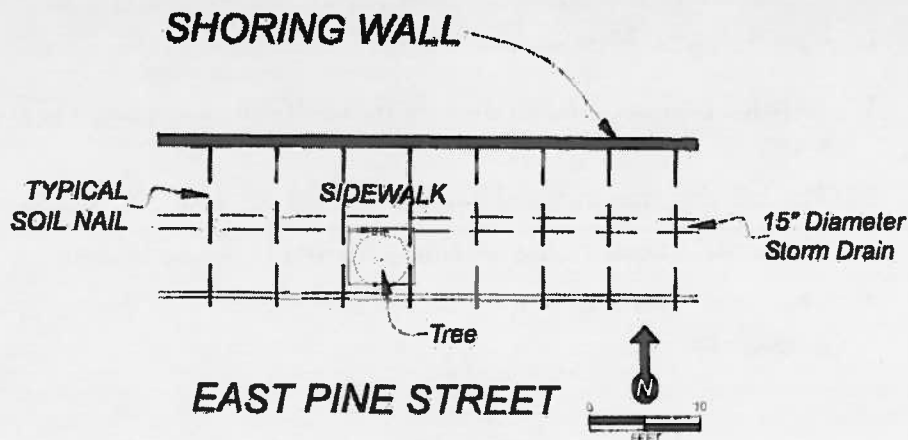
Typical Area Illustrating The Proximity Of The Soil Nail Wall Face To Existing Utility Alignments And Trees
